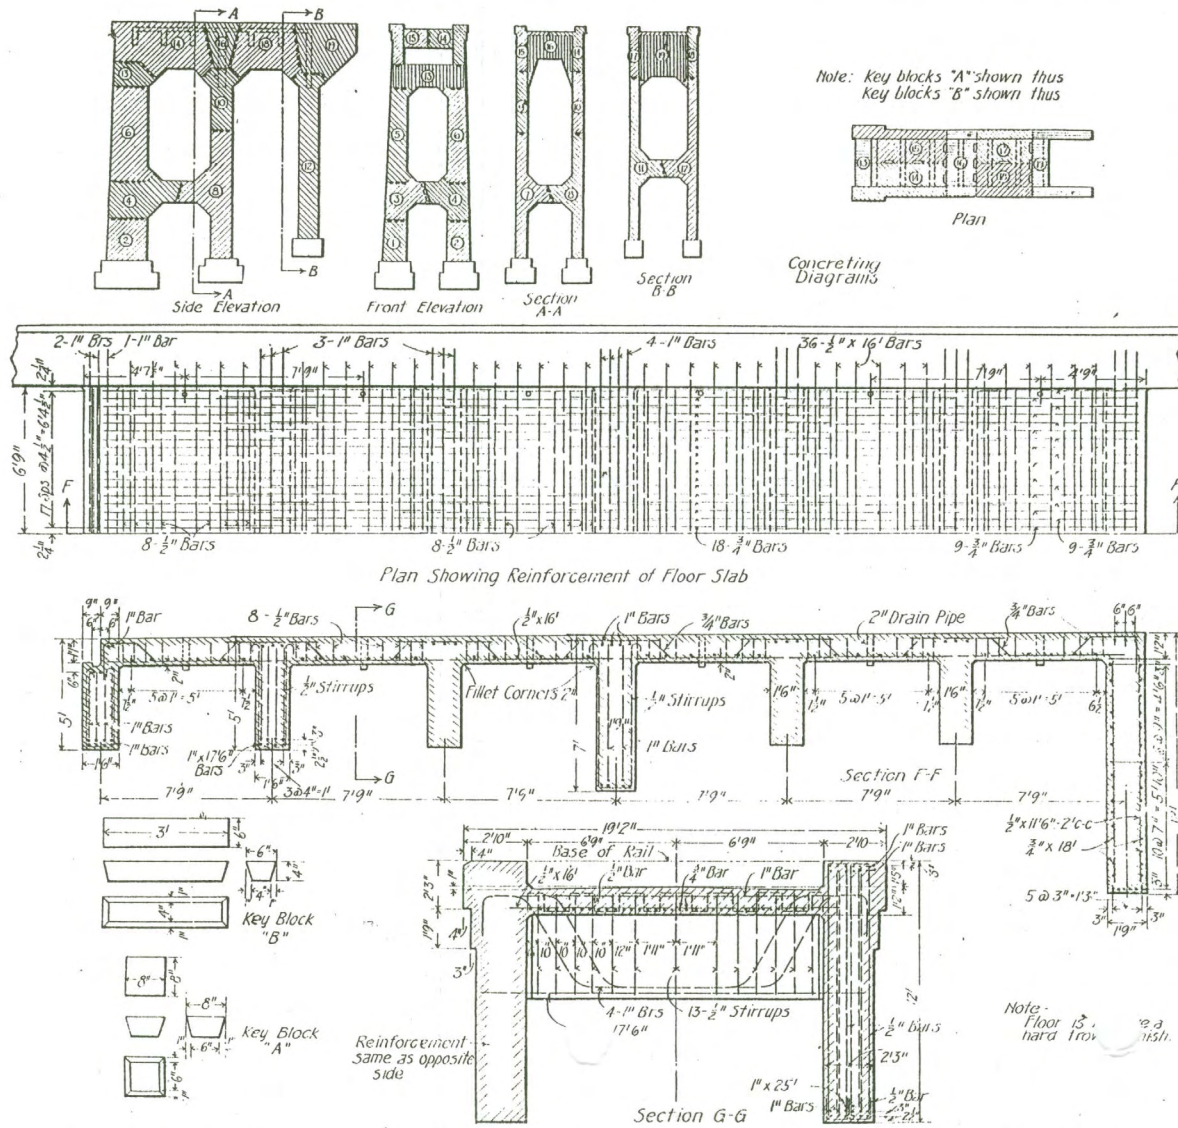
Concreting Diagrams and Details of Design of East Abutment of Judith River Viaduct.
